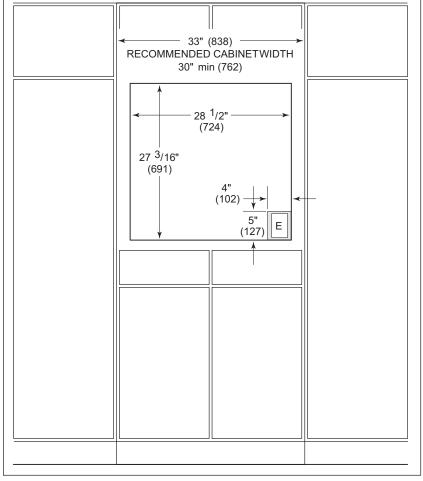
Front Cutout Dimensions and Electrical Placement #802984 Rev. C June 2005 2-5
